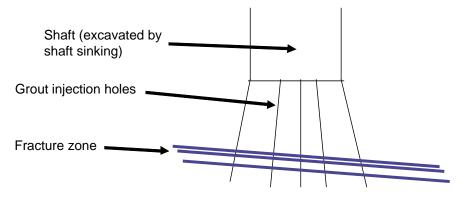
Principles for grouting sub-horizontal zones in the skip shaft. The grout holes deviate corresponding to a distance of about 2 m from the tunnel periphery at the end of the holes.
